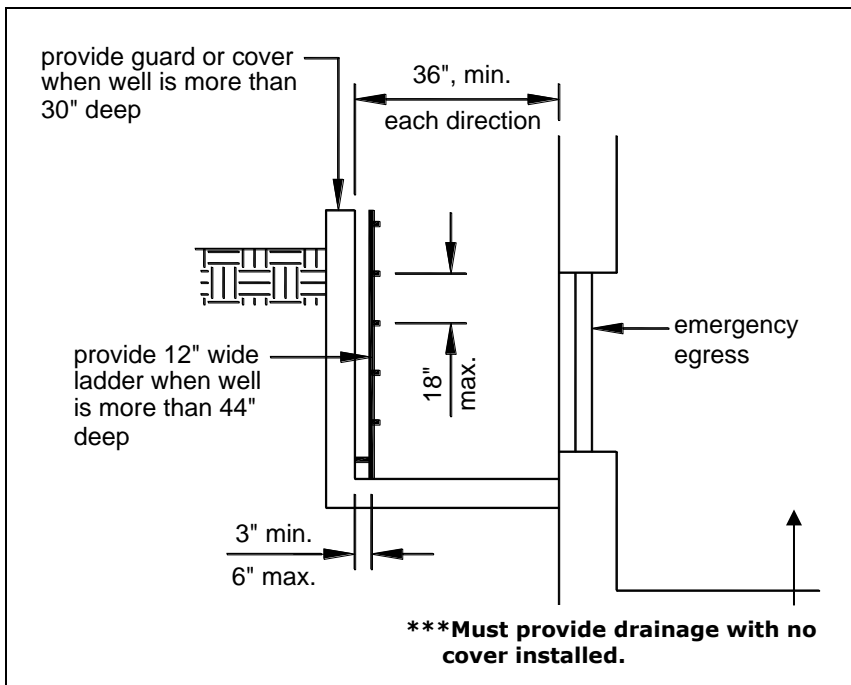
TYPICAL WINDOW WELL REQUIREMENTS
